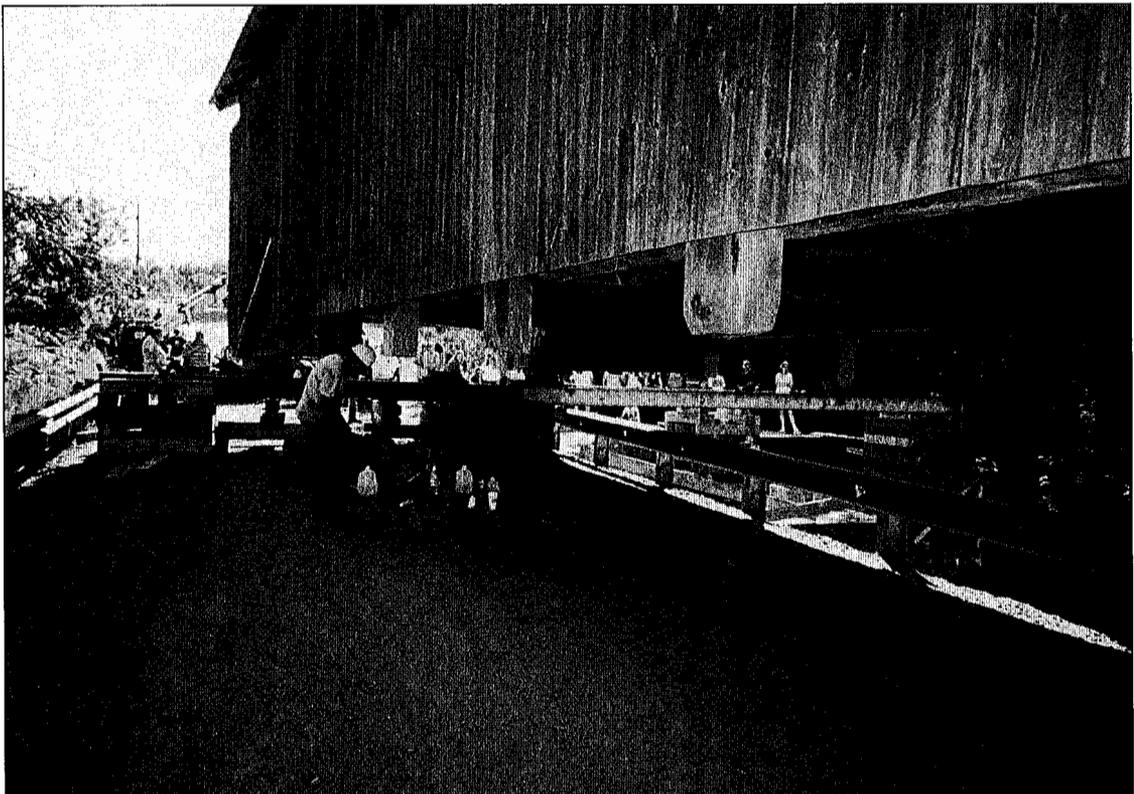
The Brown's River Covered Bridge moving sideways.
